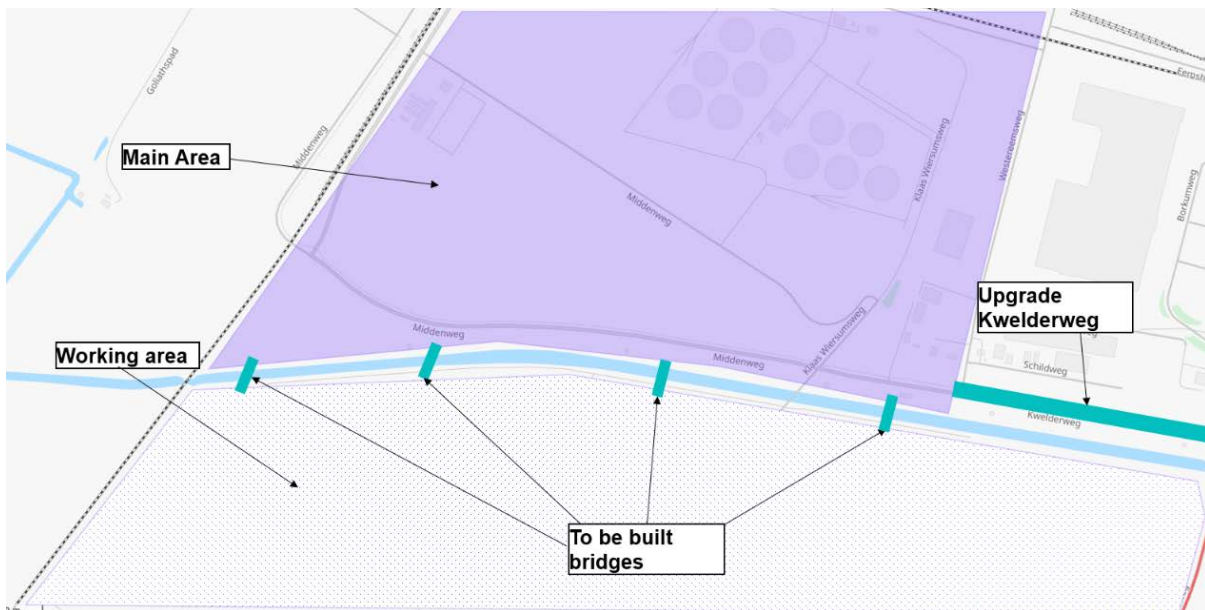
Upgrade to road infrastructure foreseen at the construction location
